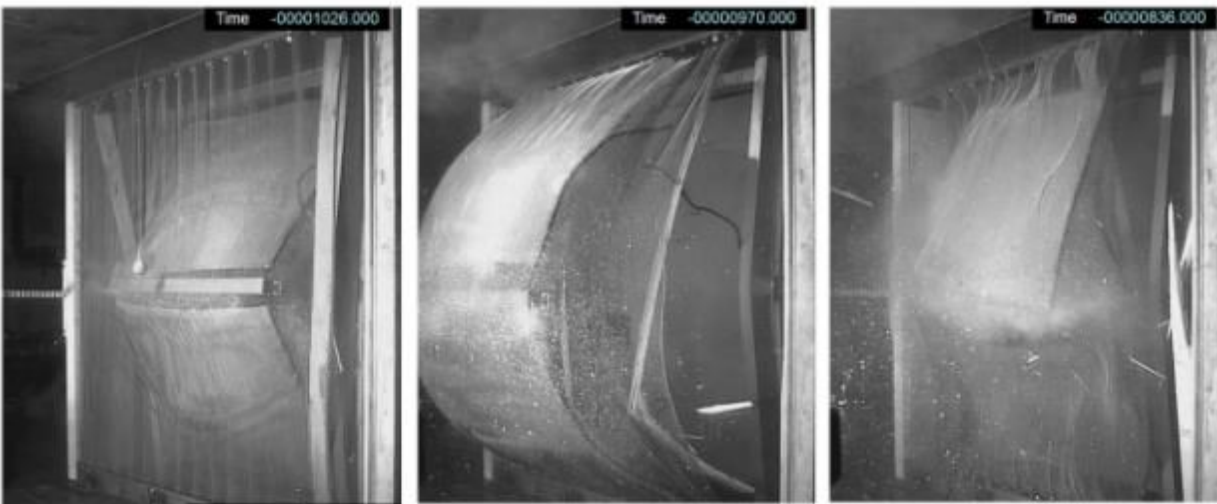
Curtain wall 1 test: a. Horizontal mullion Detachment
